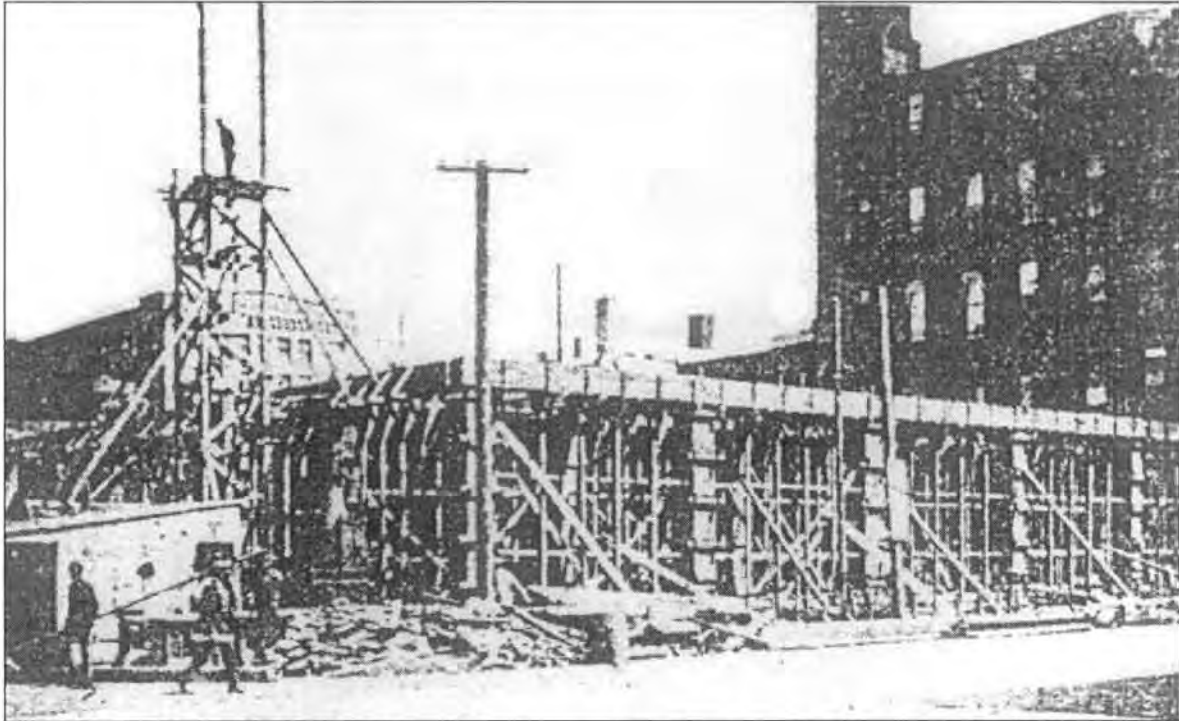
Completed first floor, framework for elevator and hoist, view northeast
